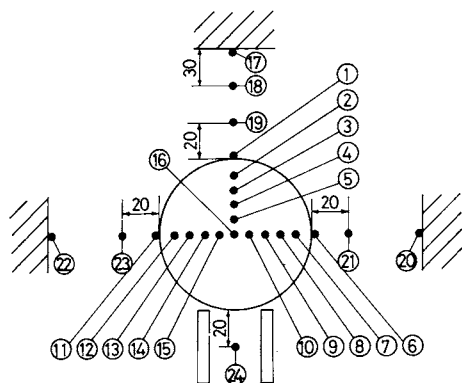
Position of thermocouple installation for specimen and environment on furnace test
